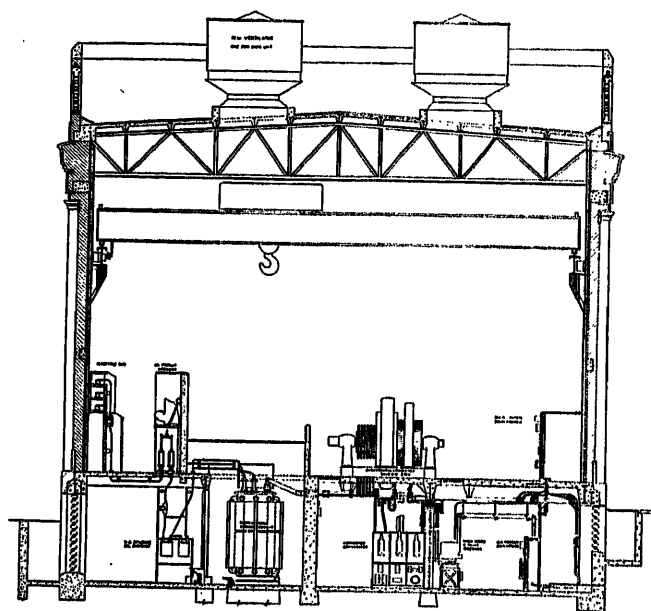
CROSS-SECTION, LOUDON SUBSTATION
